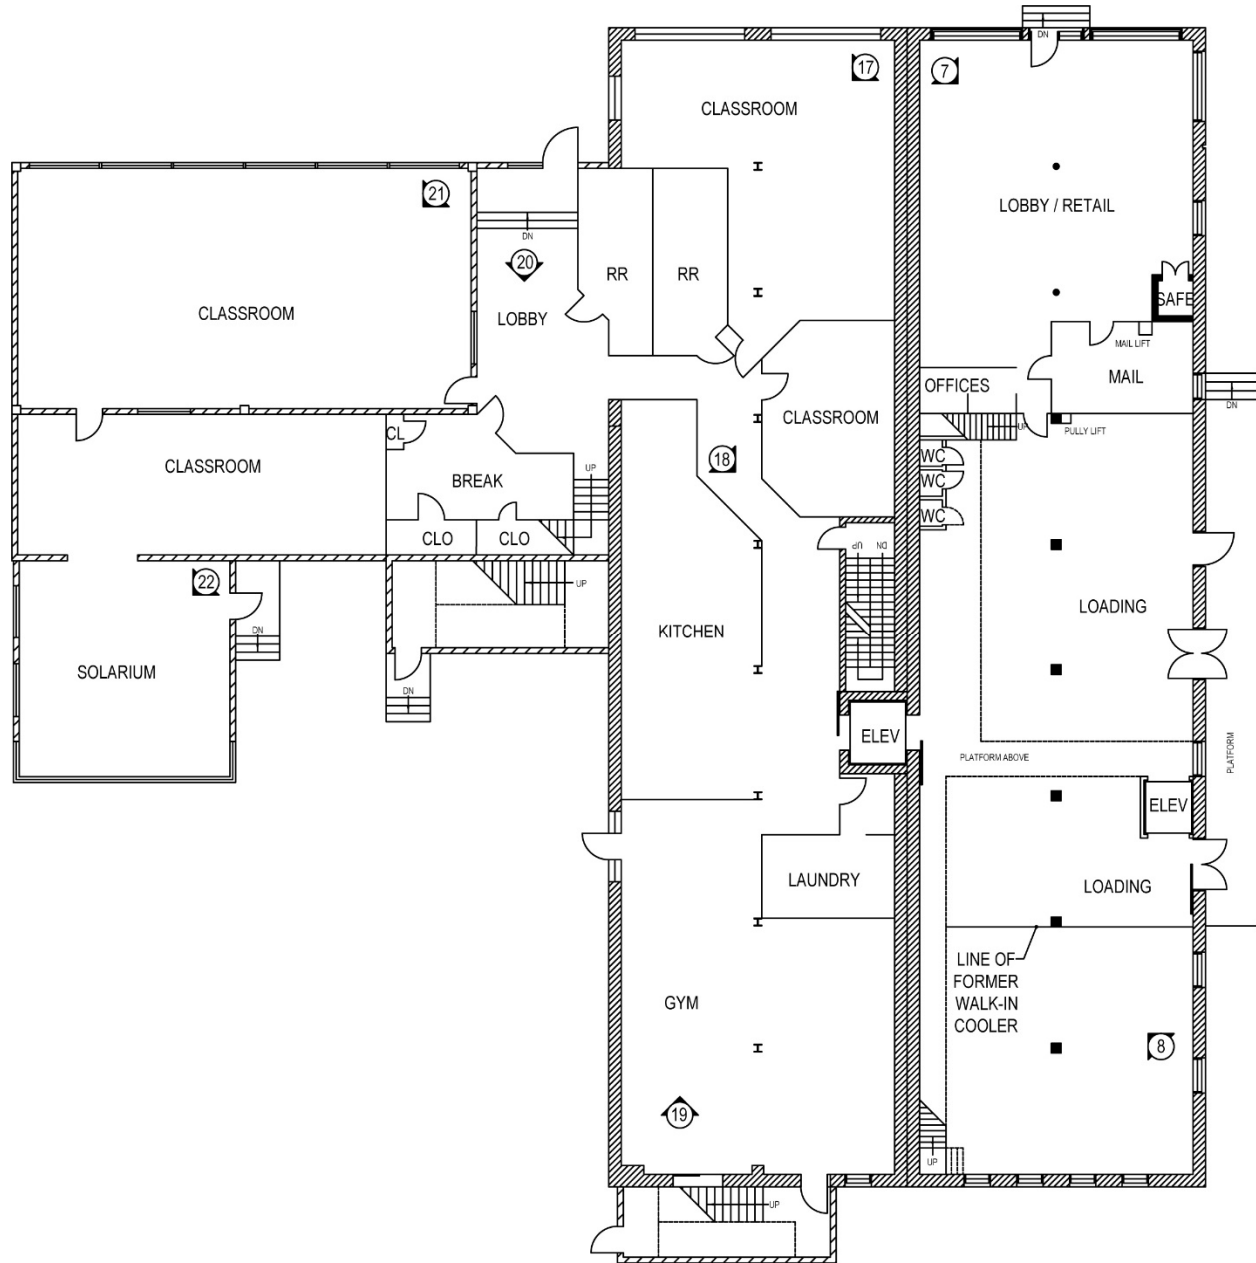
First Floor Plan with Photo Locations (not to scale)
